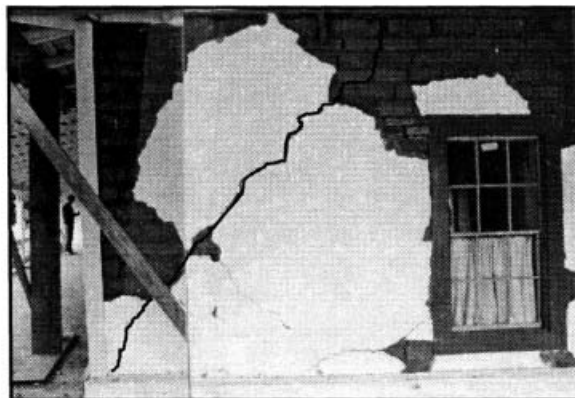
Leonis Adobe. Diagonal crack at the southeast corner on the second floor (crack highlighted).
